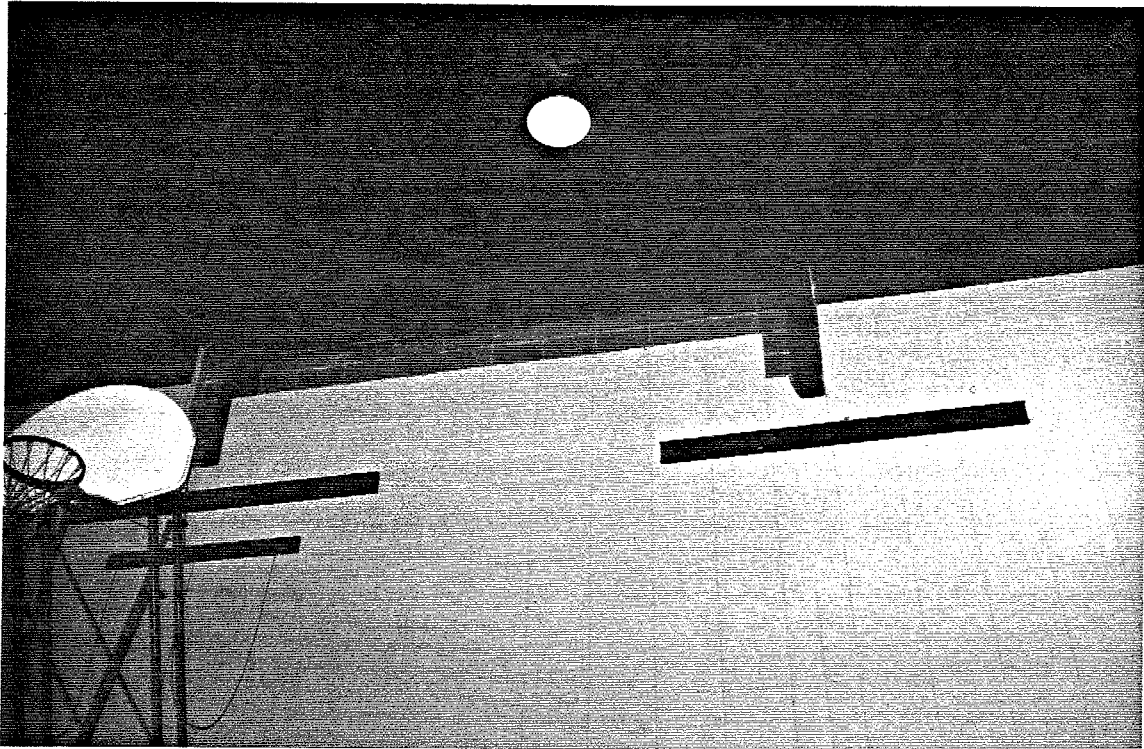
Damage to unreinforced masonry wall in gymnasium.
